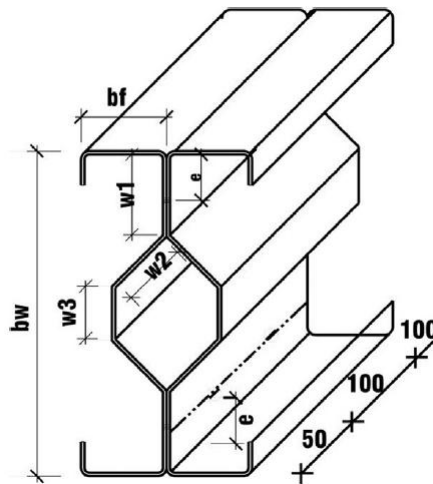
Screws arrangement along column specimen. (Abu-Hamd, Abdel-Ghaffar and El-Samman, 2018)
